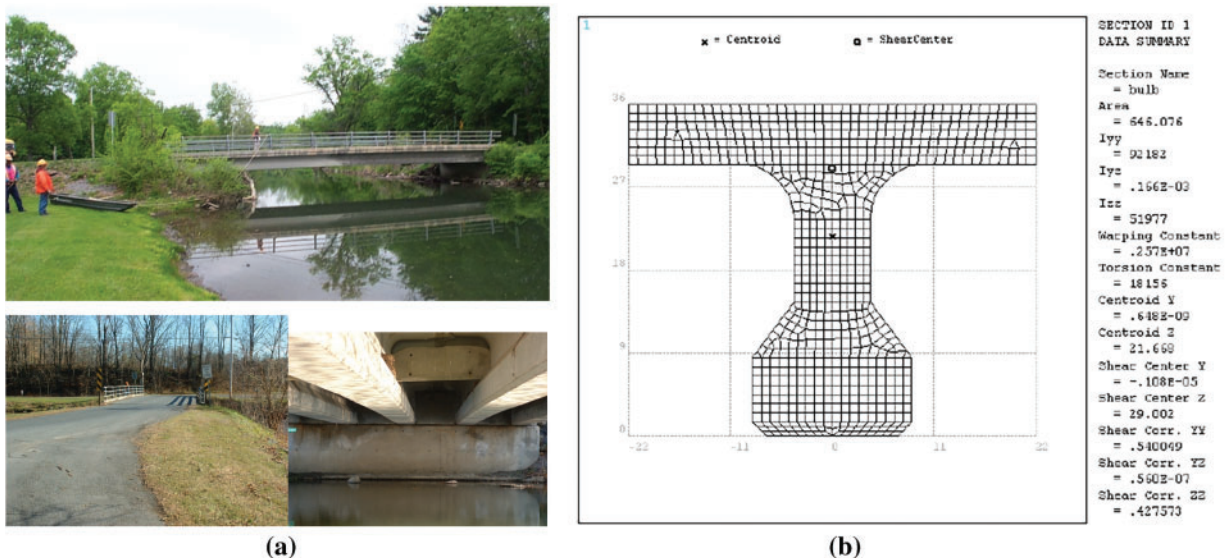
(a) Bridge views. (b) Typical beam section and properties
